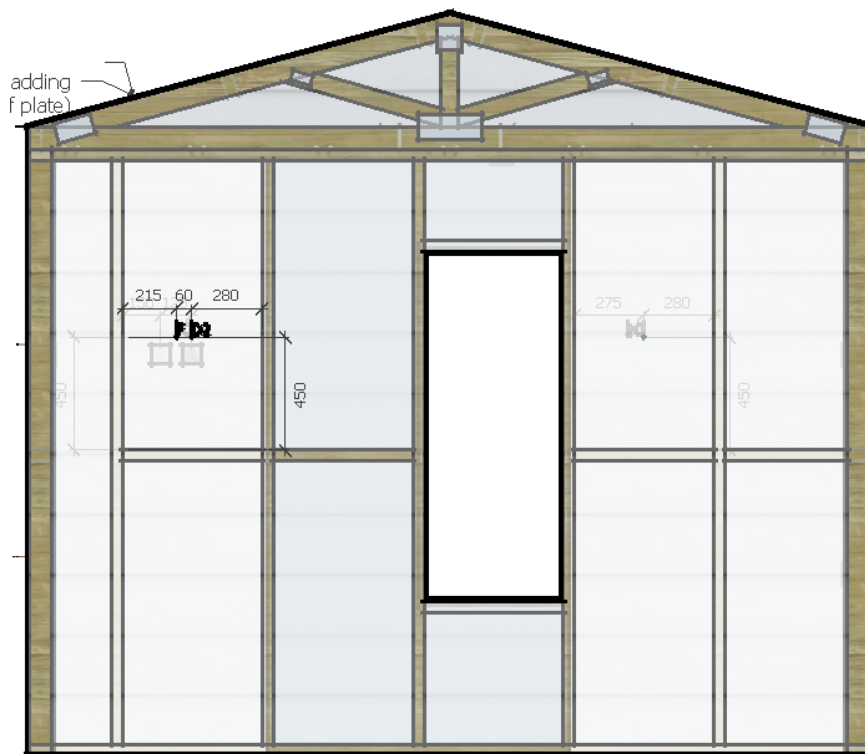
Experiment #2 general location of thermocouples on fixed end wall cladding (viewed from outside)
